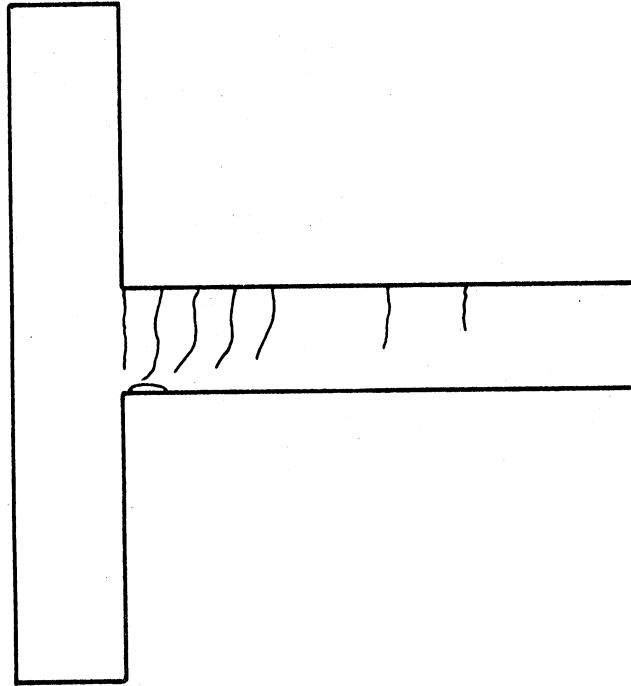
Cracking and Spalling in Beam after First Quarter Cycle of Severe Earthquake Loading
